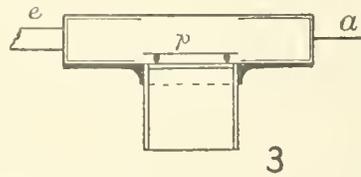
SAME. SECTIONAL ELEVATION.
